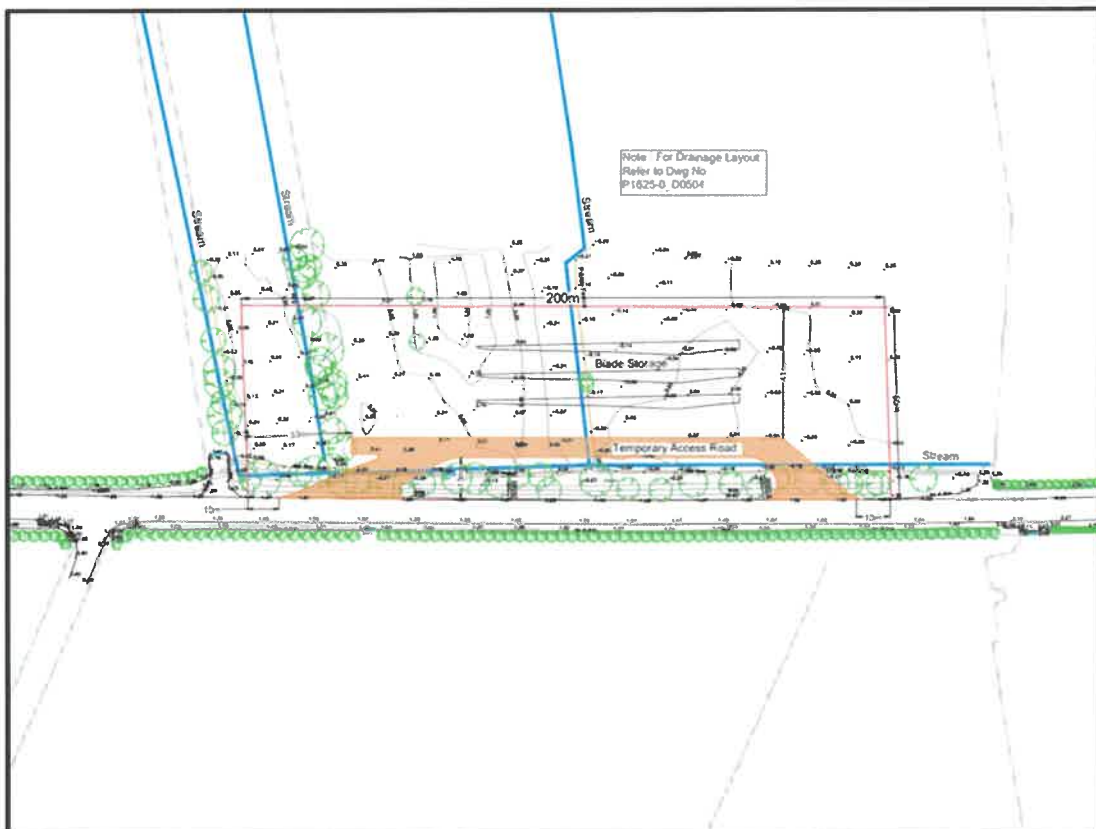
Site Layout Plan, Temporary Transition Compound, Court, Kildimo
